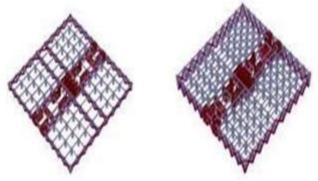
Conventional outrigger system and Virtual outrigger system
